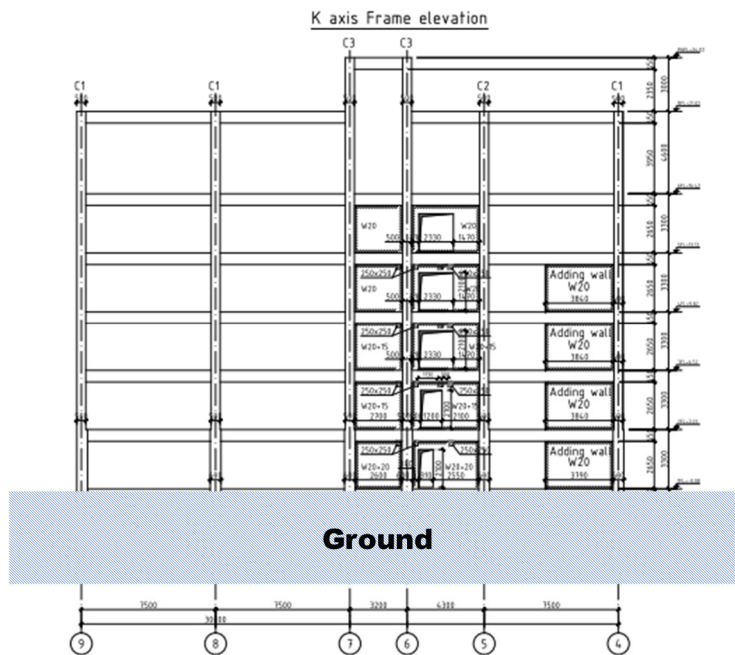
Example of Strengthening the RC building by Additional Walls
